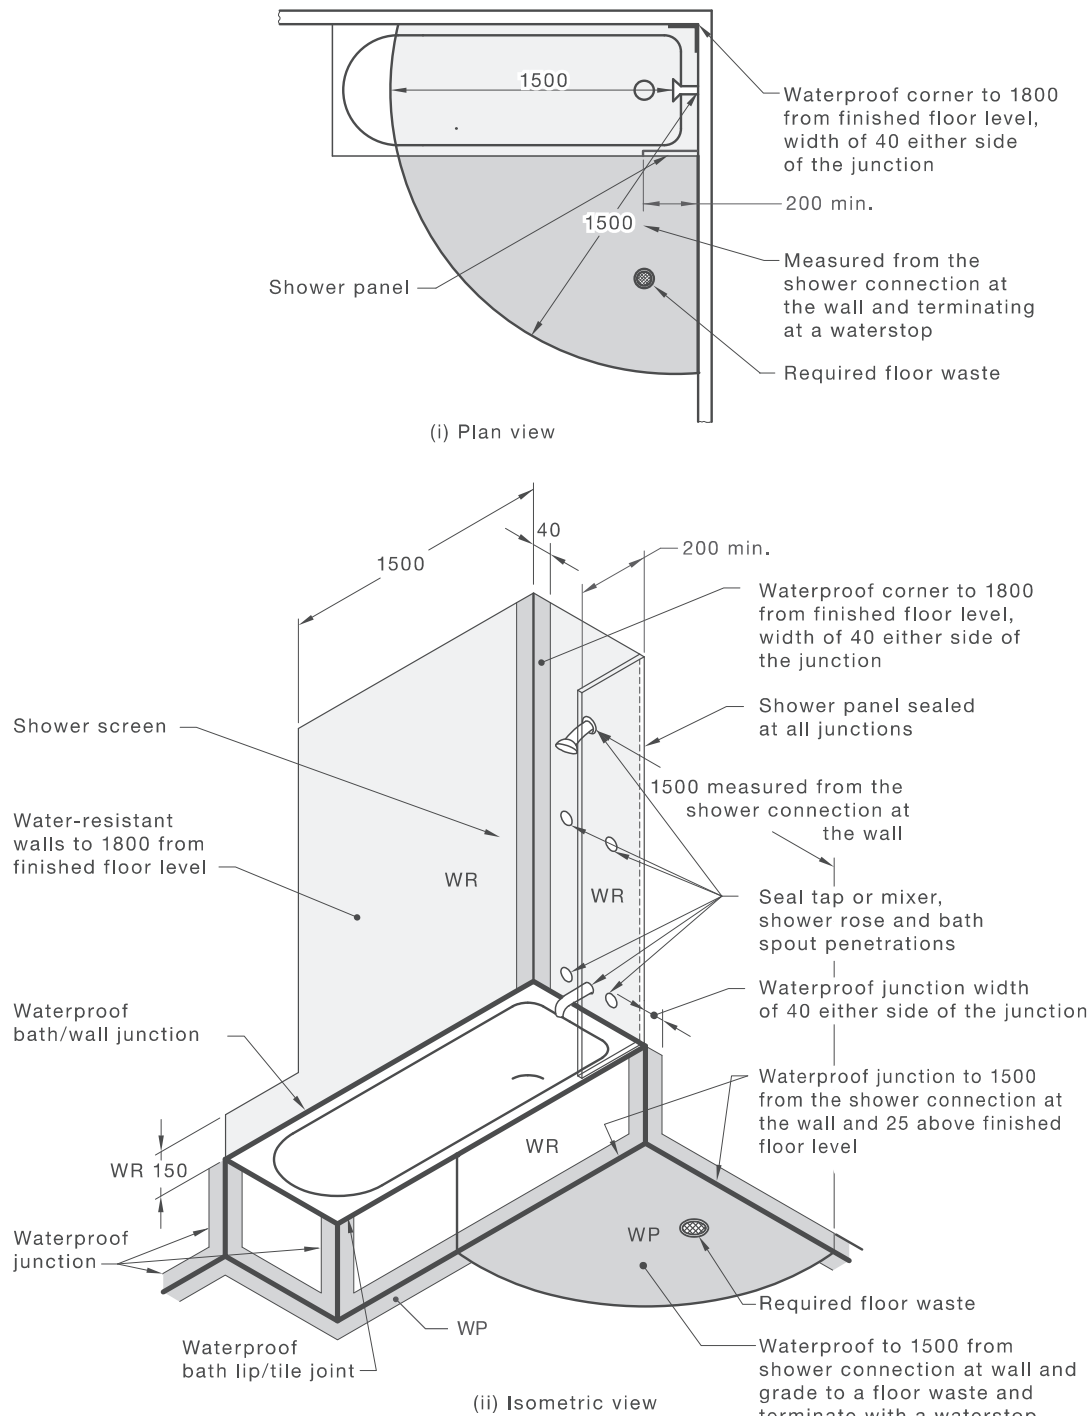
(in part) UNENCLOSED SHOWERS ABOVE BATHS—AREA PROTECTED FOR CONCRETE AND COMPRESSED FIBRE-CEMENT SHEET FLOORING
